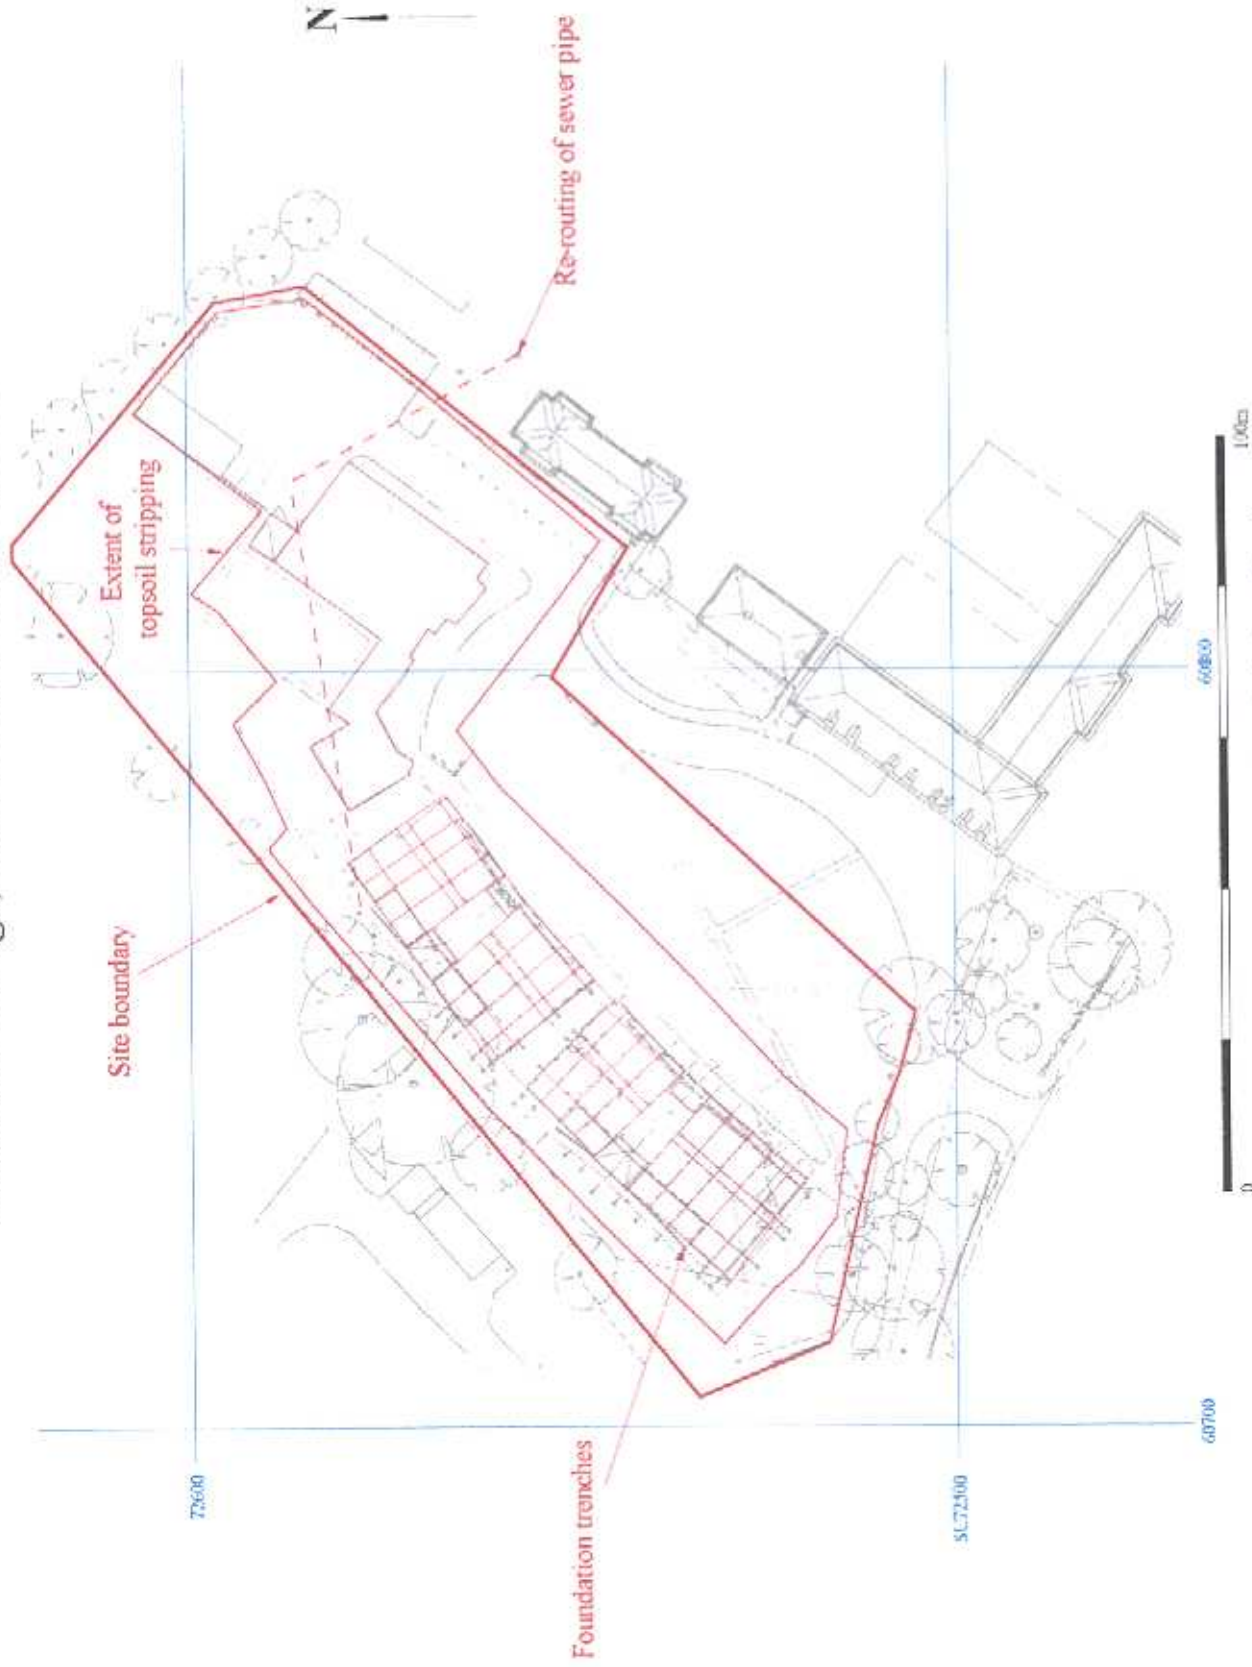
Plan of site showing extent of topsoil stripping and location of foundation and service trenches observed during watching brief.
